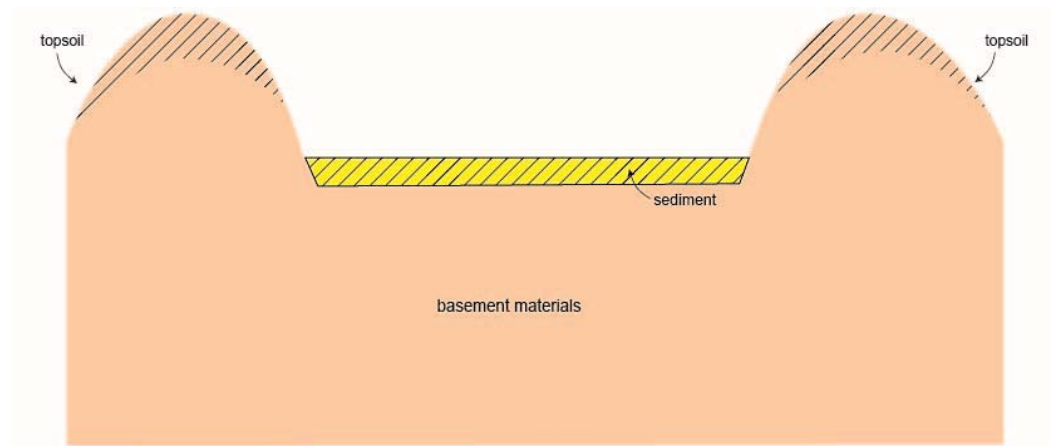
Cross section of the Nipan Dam showing dam walls and base
